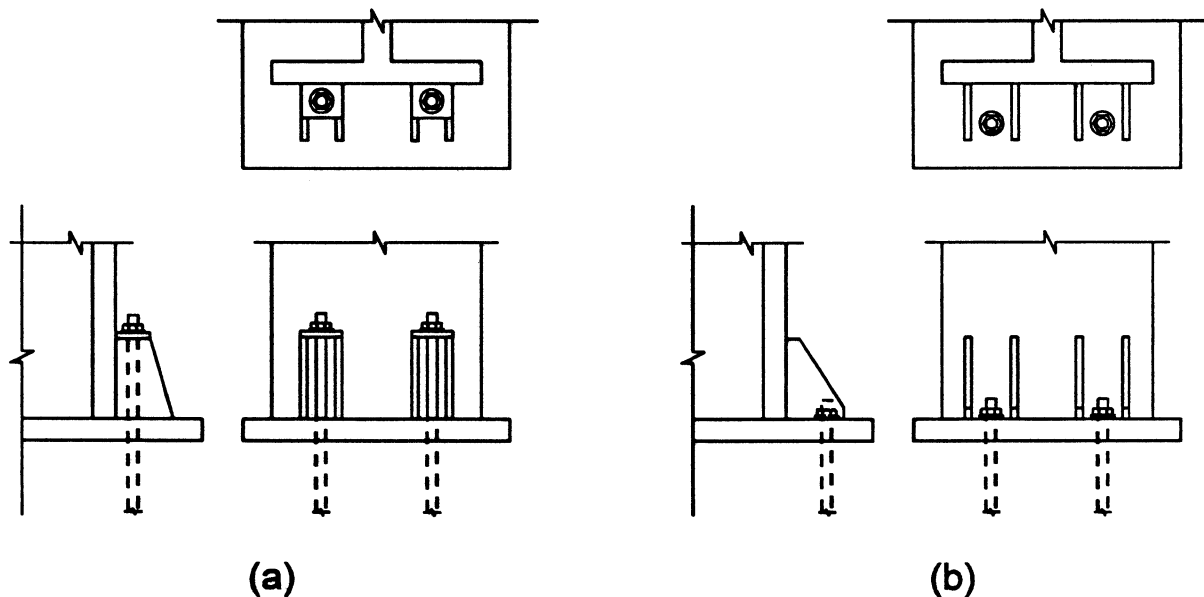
Two examples of base plates with stiffeners to aid in load transfer
